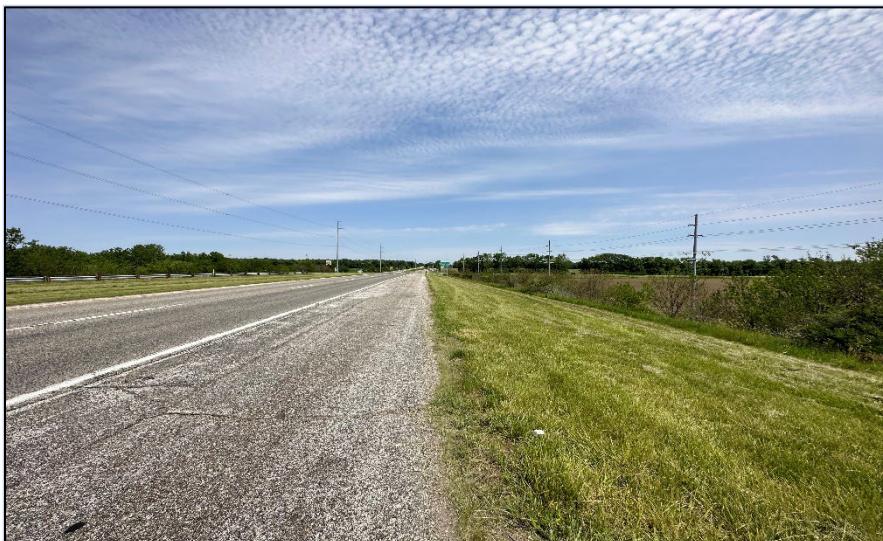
Facing north from SR 63 northbound, north of the bridges.
